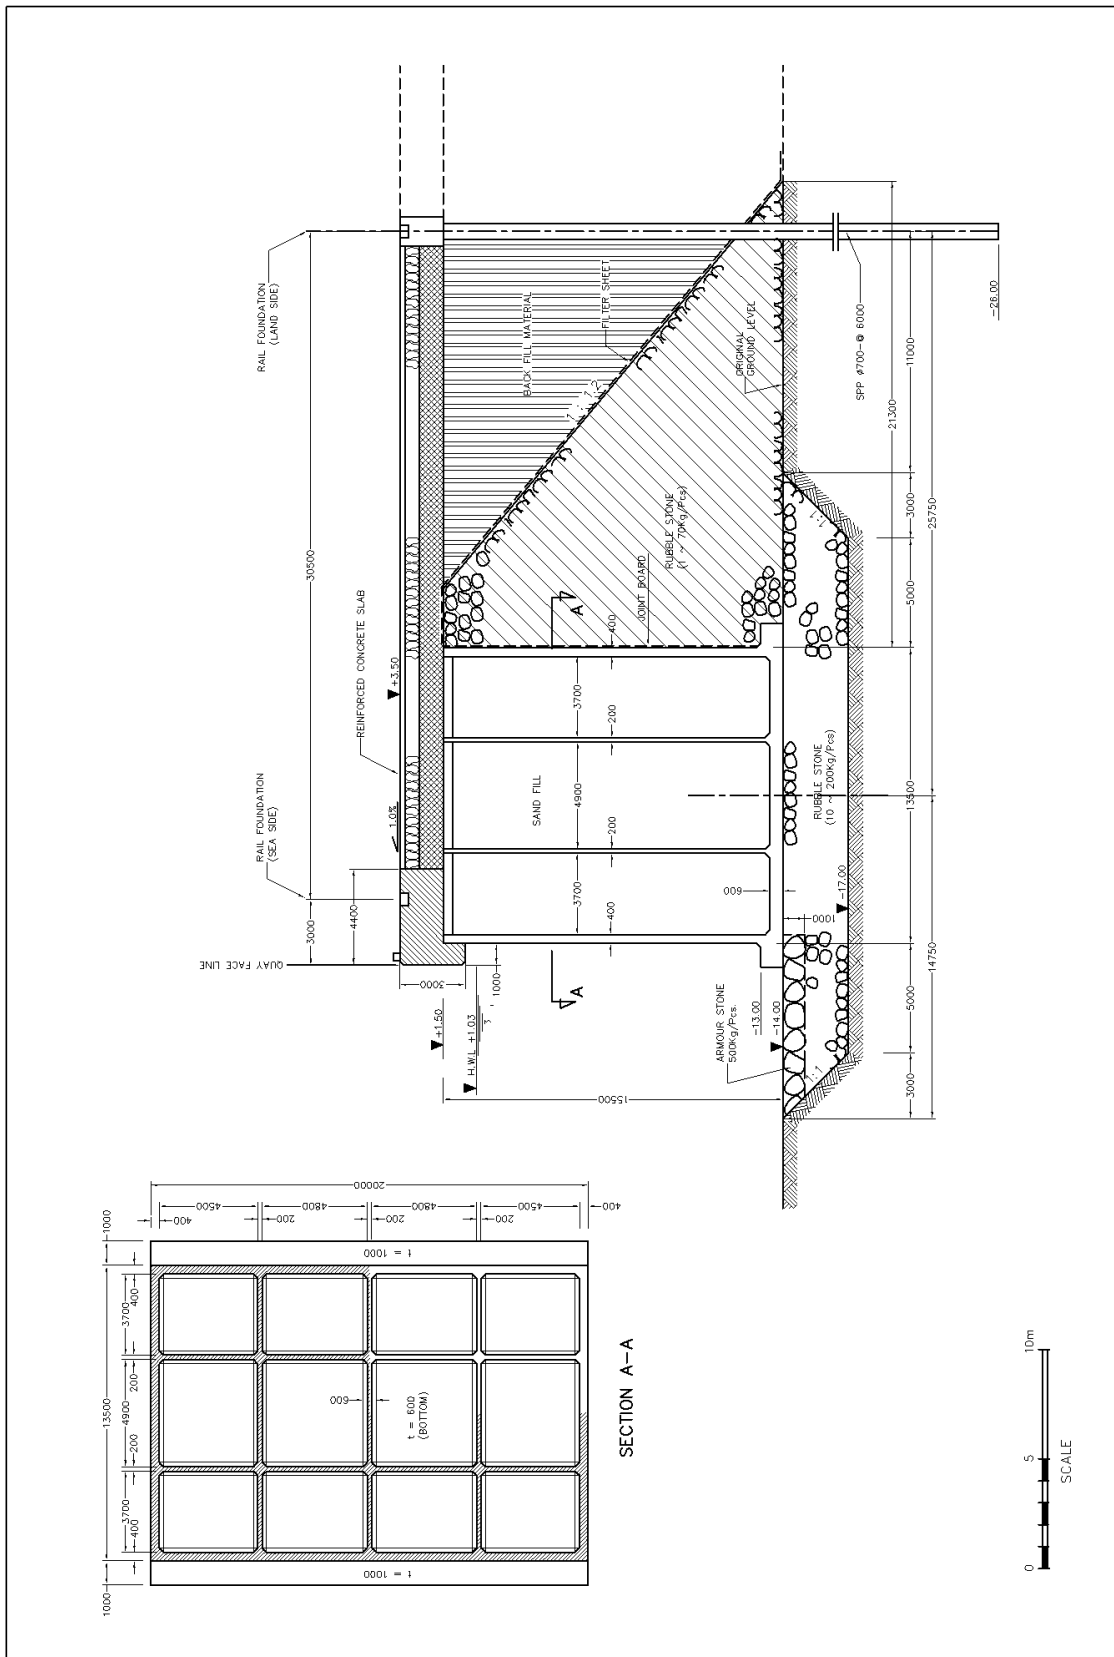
F-9 Typical Section of Concrete Caisson Type Quaywall
